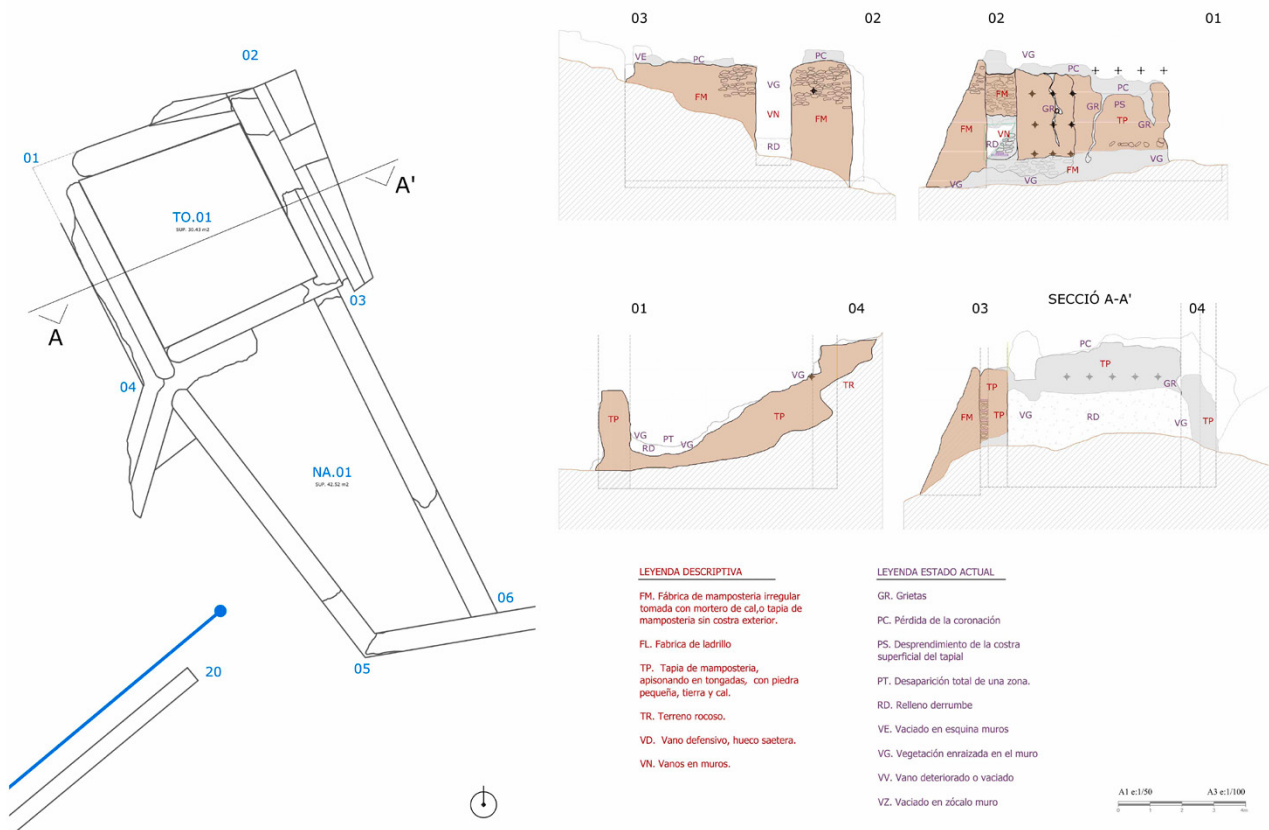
Floor plan, elevations and section of the lower tower. 2017 (Own elaboration).
